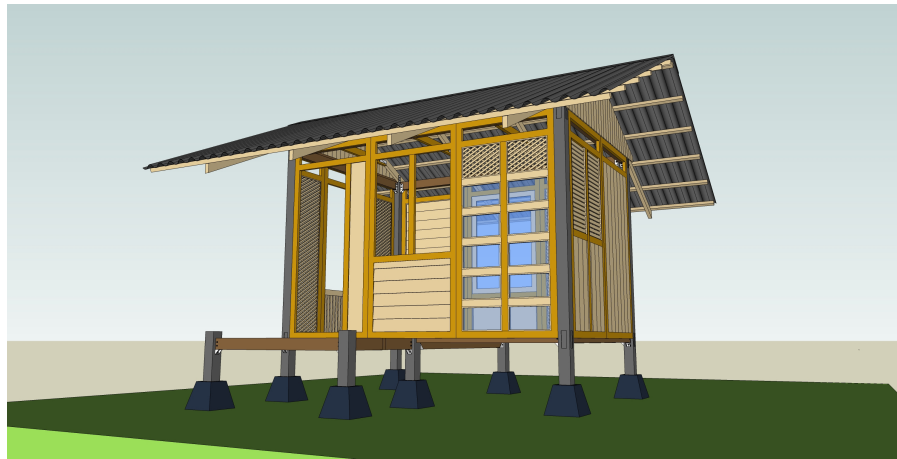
Steel Brackets Located at Lower Column to Receive Floor Beams
